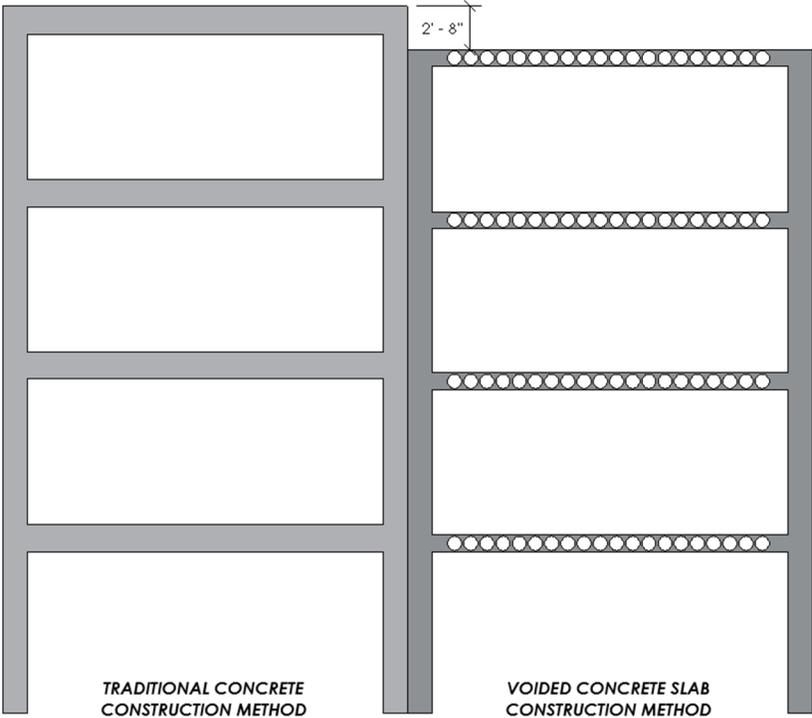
Floor-to-Floor Height Reduction of Flat Plate Voided Slabs
